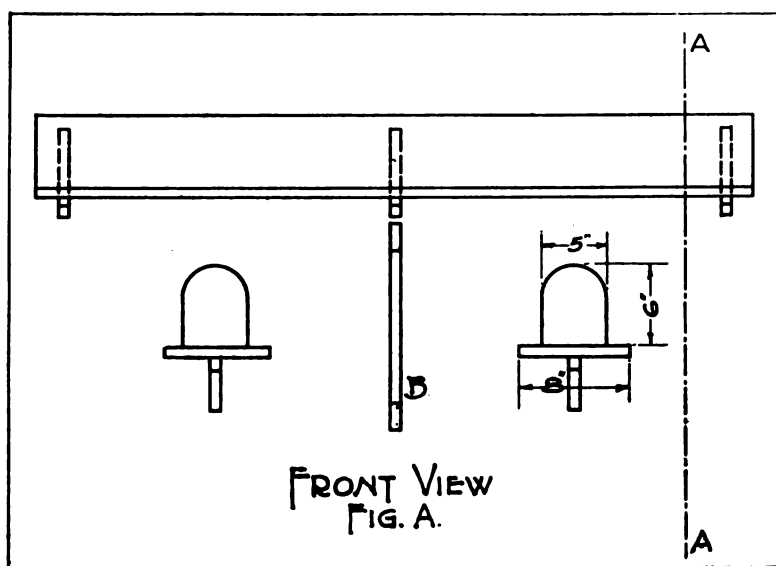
PLATE XIII—A BARN WALL NESTING PLACE FROM DR. TREUBENBACH'S GERMAN WORK ON PIGEON HOUSES.
